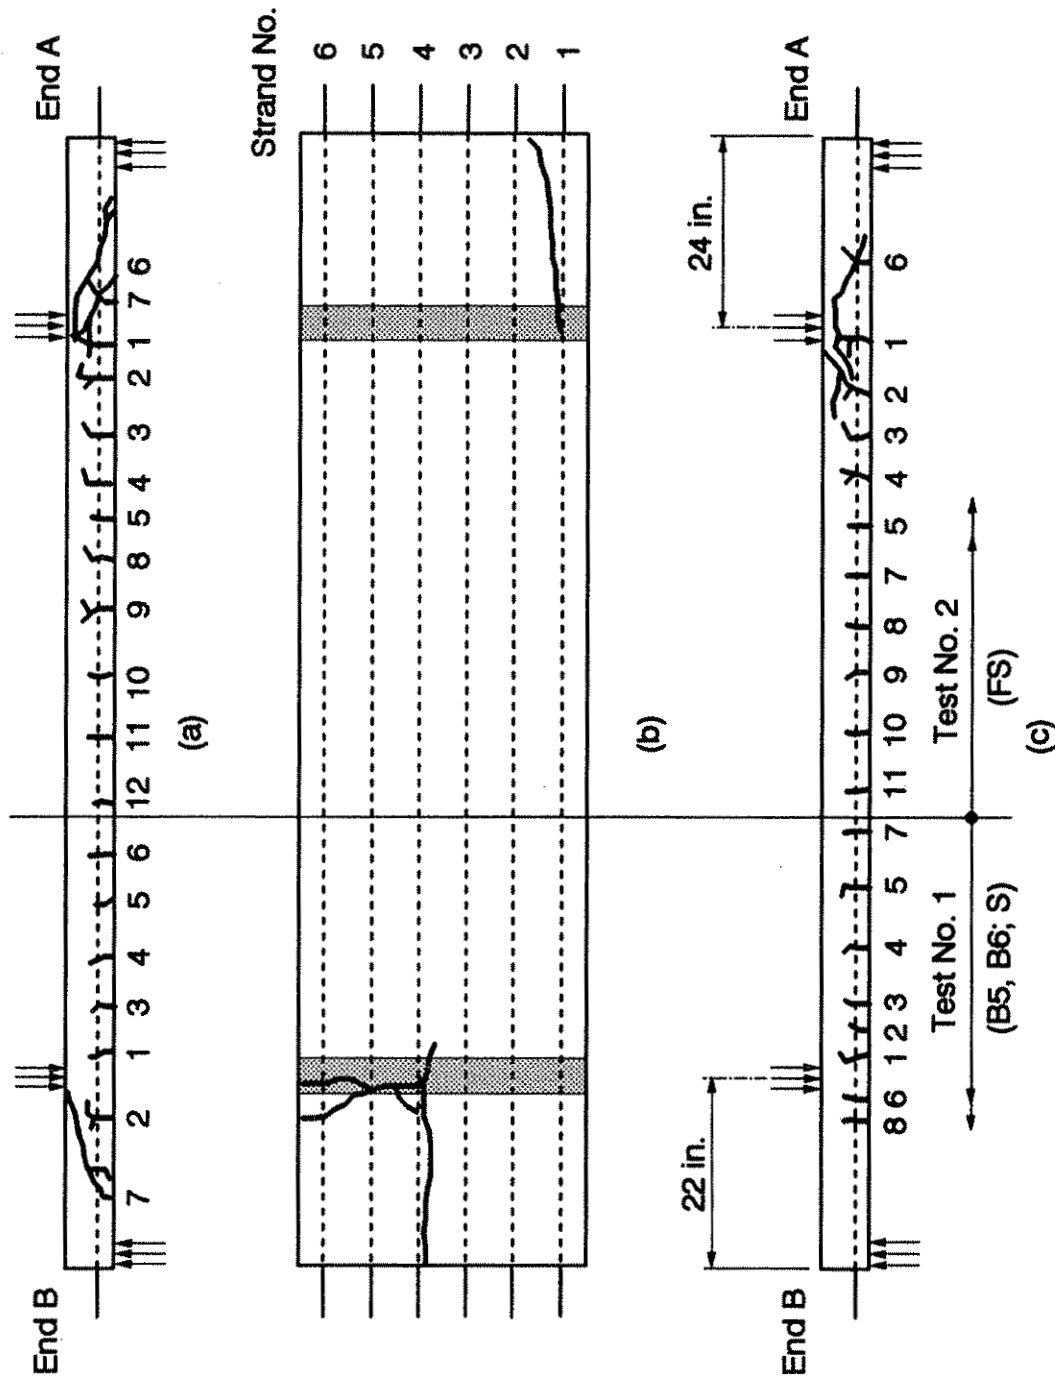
Crack patterns for D-type Specimen No. 12-6.0DC-1:
